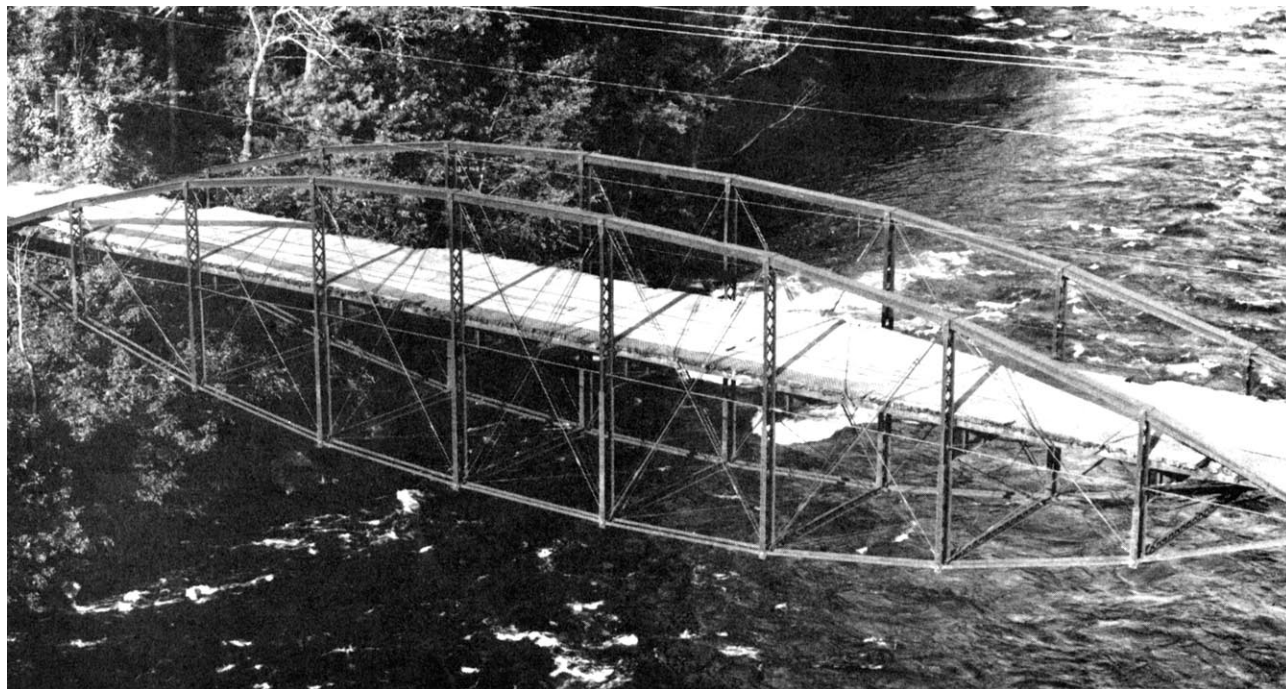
Old Corinth Road Bridge over the East Branch of the Sacandaga River, Hadley, New York (photo credit: Jet Lowe).
